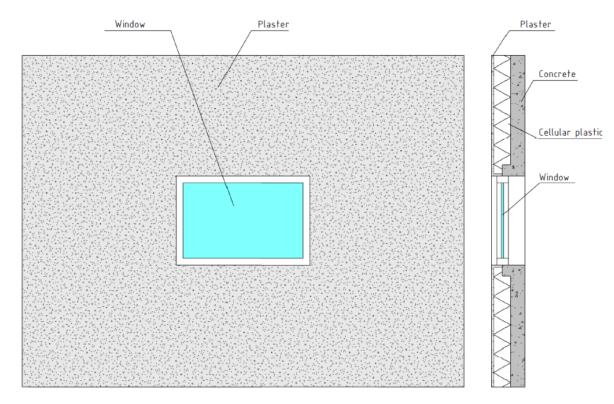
Typical design of an exterior wall with combustible insulation with plaster system.
